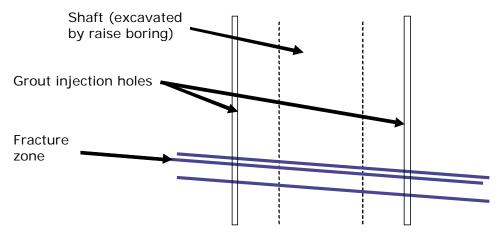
Principles for grouting of sub-horizontal zones in the elevator – and ventilation shafts.
